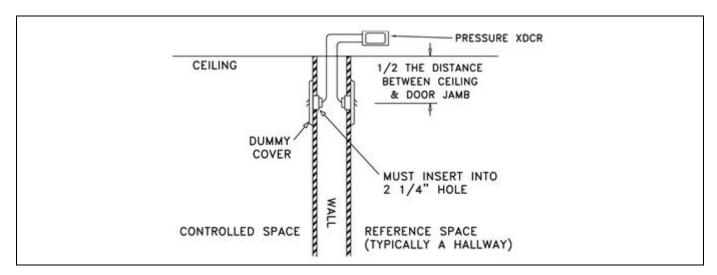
Cutaway View of Mounted Pressure Transducer Assembly
